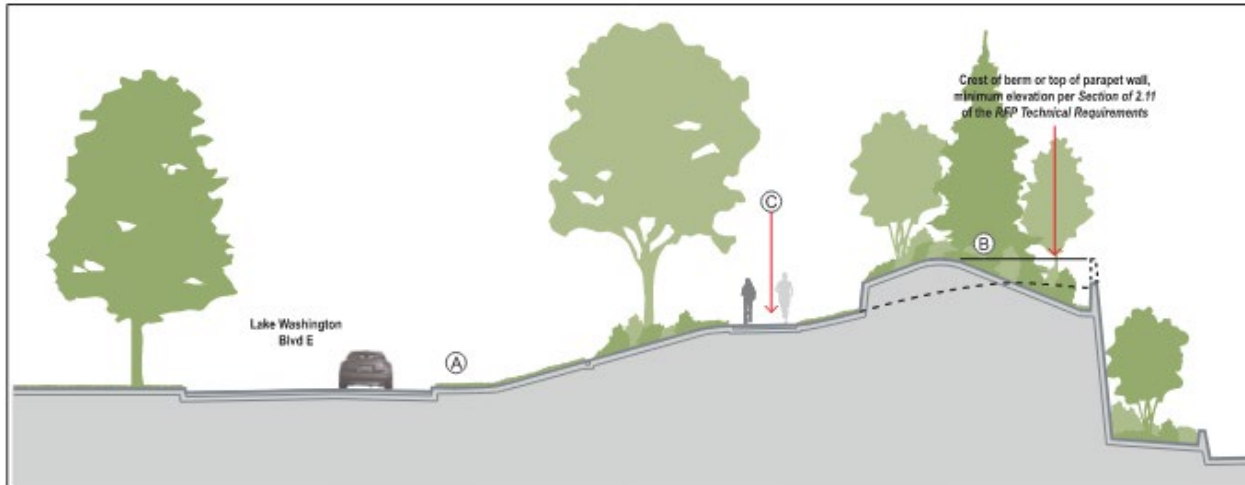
E Lake Washington Blvd east of 24th Ave E section
